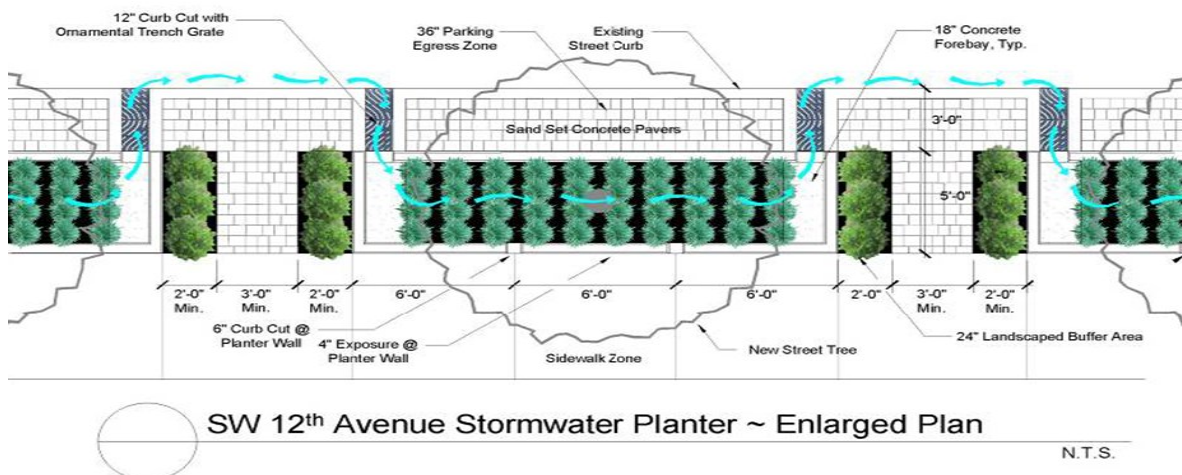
SW 12th Ave Stormwater Planter Plan (Source: Hoyer et al., 2011)
